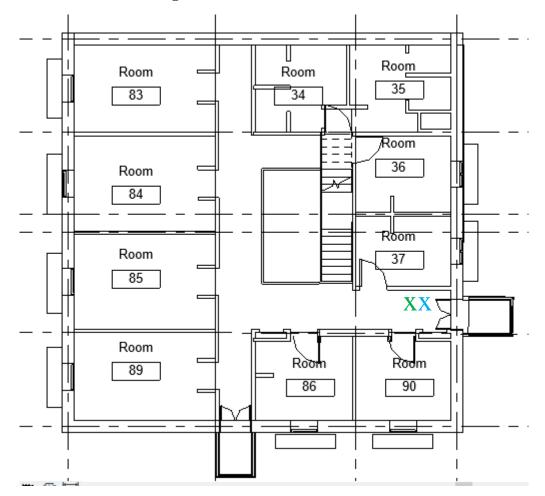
Location of colour coded waste bin at the X mark on the floor plan.
